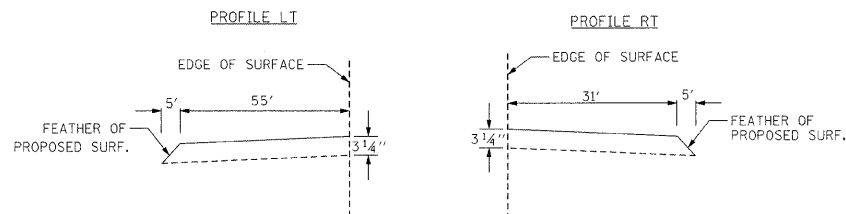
DETAILS OF SURFACING AT INTERSECTIONS AND SIDEROADS
